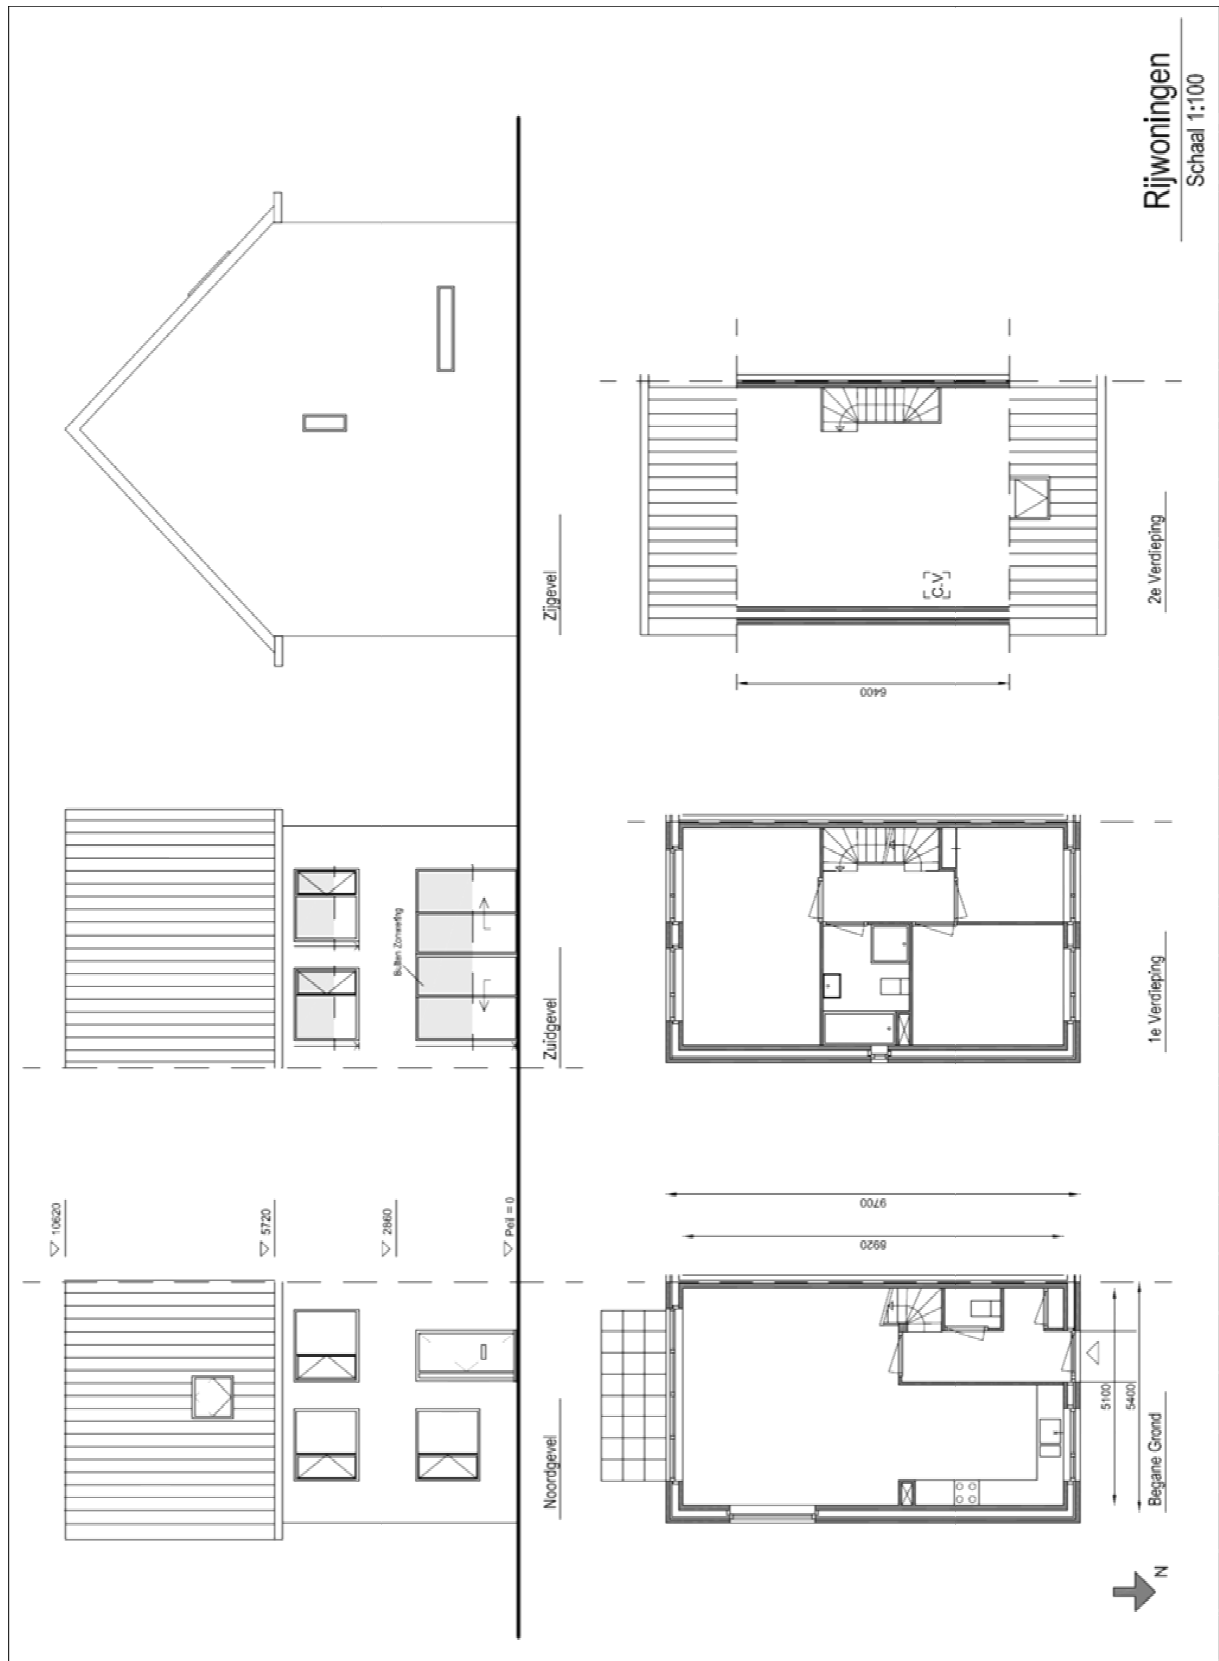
façade views and floor plans of the reference corner dwelling (SenterNovem, 2006).
